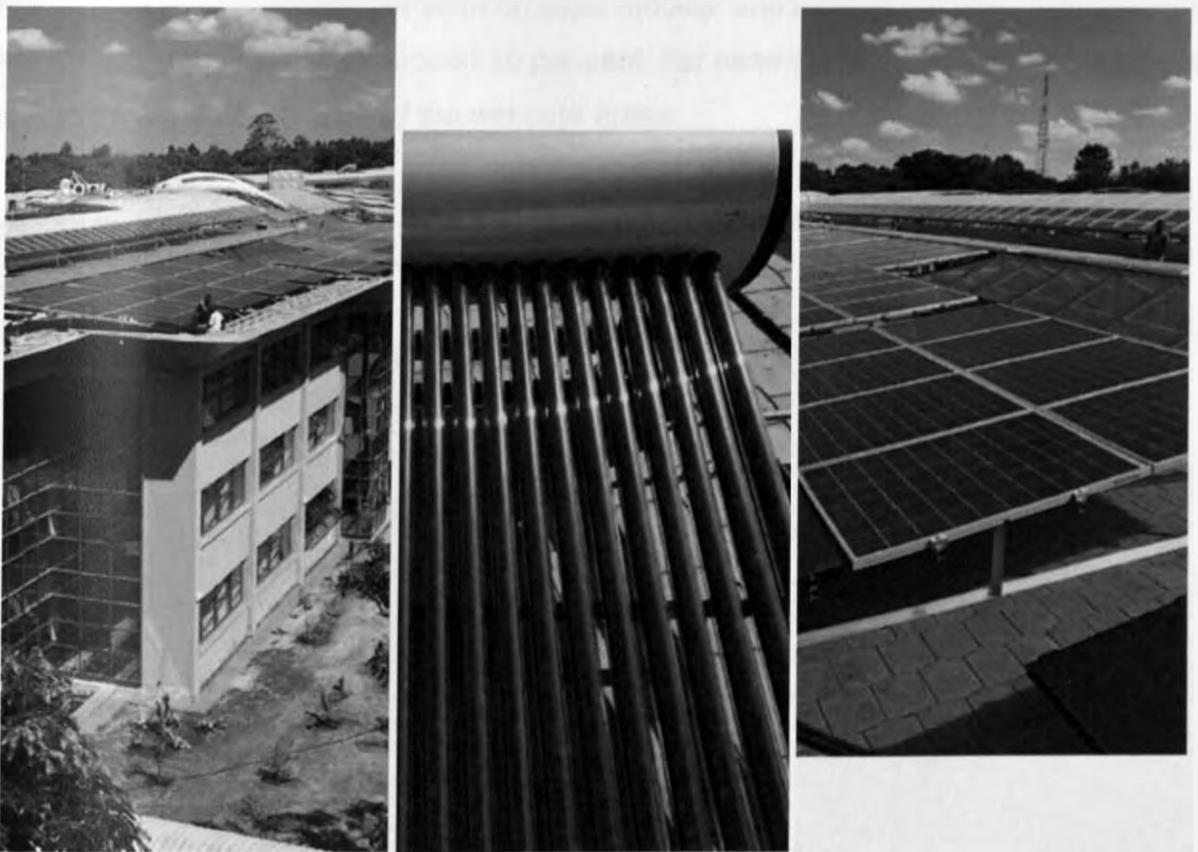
the Roof of the Entire Building covered by 1600m² of Photovoltaic Panels and Solar Water Heating Equipment
